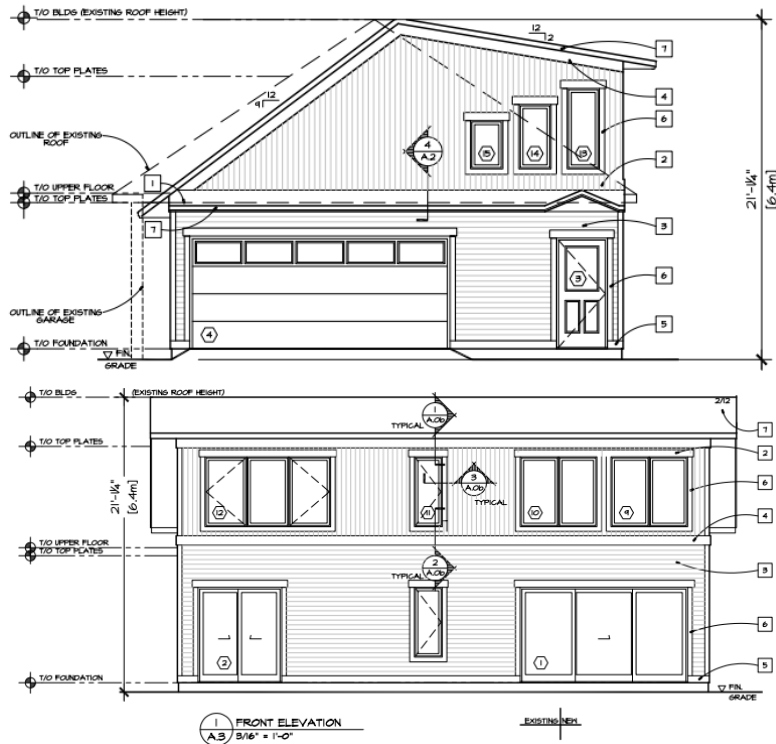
Applicant's proposal. Upper wall extends the full width of the lower wall, and is the main roof line.
